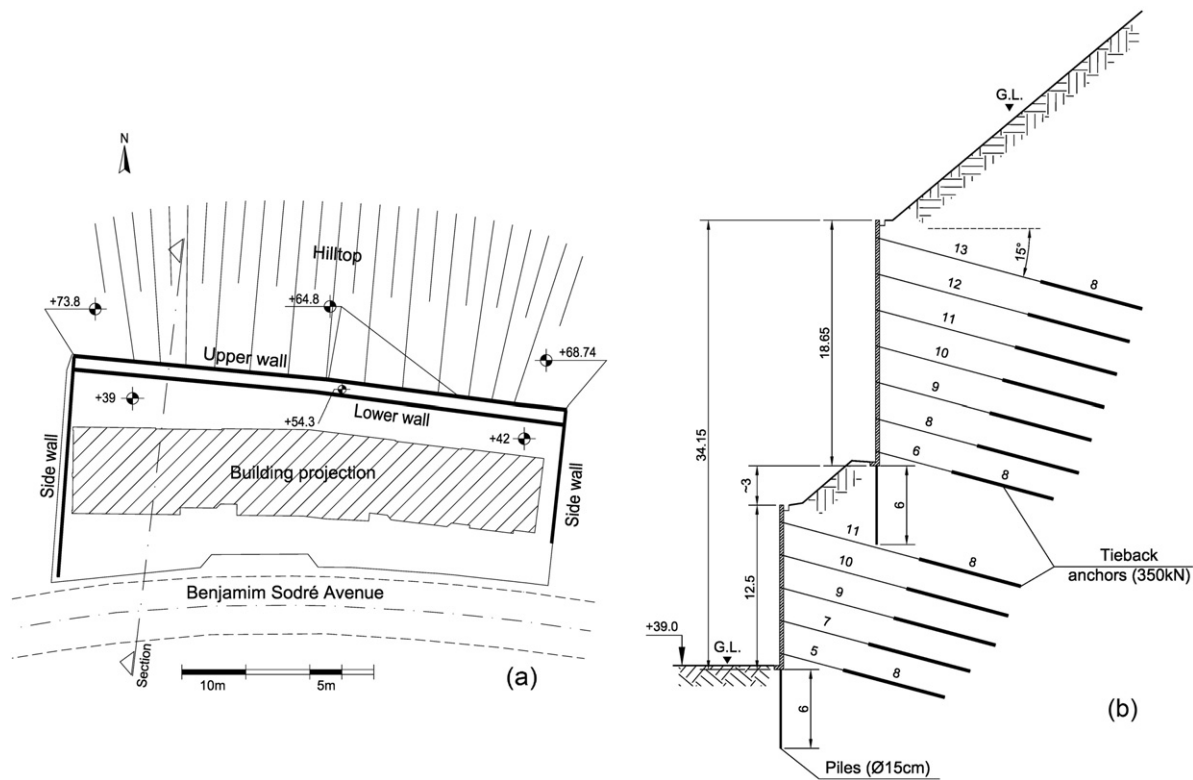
Retaining structures of the original design (dimensions in meters): (a) excavation plant and (b) cross section.
